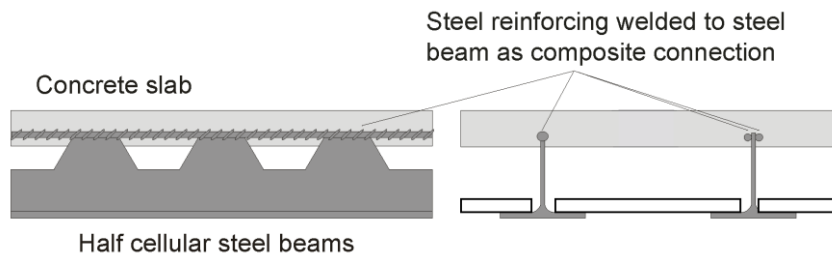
Novel type of composite slab with integrated installation floor using cellular beams: the concrete slab is placed on top
